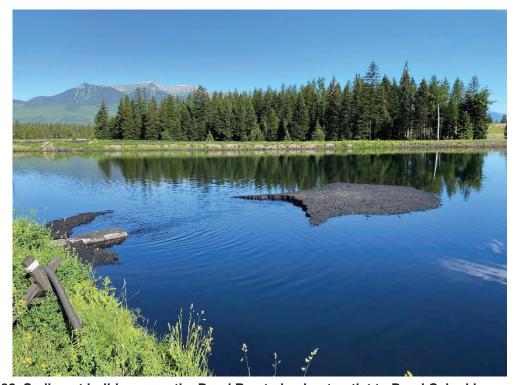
Sediment build up near the Pond B gated culvert outlet to Pond C, looking northwest
